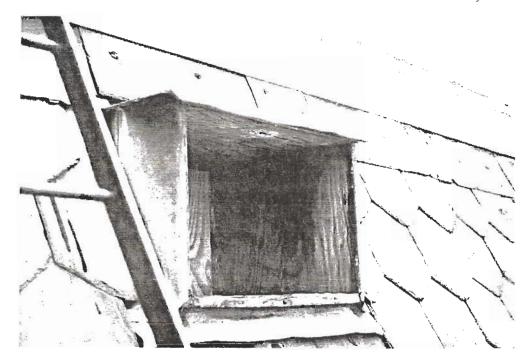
West Elevation at Mansard Roof Showing Typical A/C Opening.
